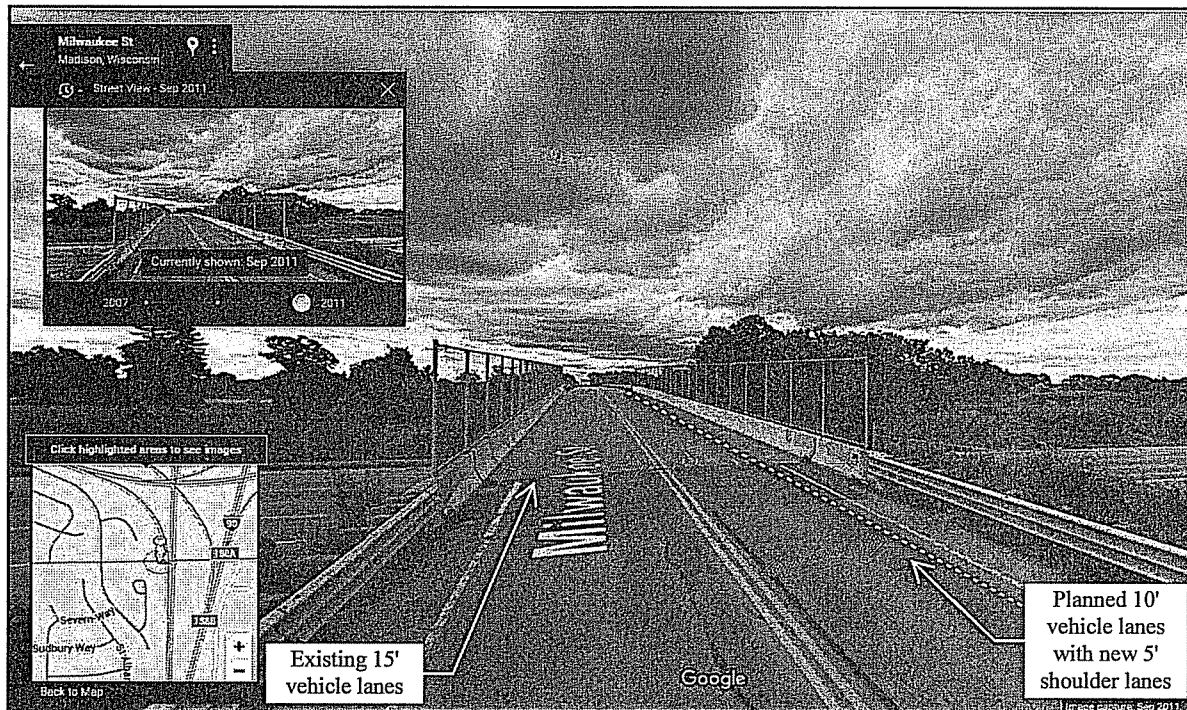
Google Streetview image looking east from South Thompson Drive approach, across the western Milwaukee Street bridge in September of 2011 – no pedestrian or bike facilities present.
